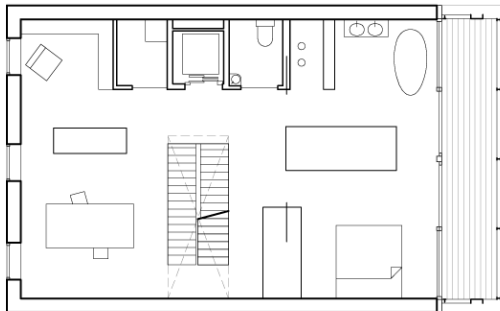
Fourth floor plan. Photo by BETA Architects (www.beta-office.com/project/3-generation_house)
